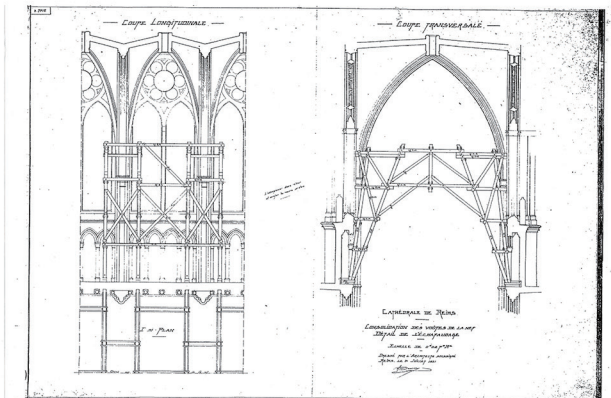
Case No. 9. Reims Cathedral, elevation (left) and section (right) showing the scaffolding (H. Deneux, 1921)
